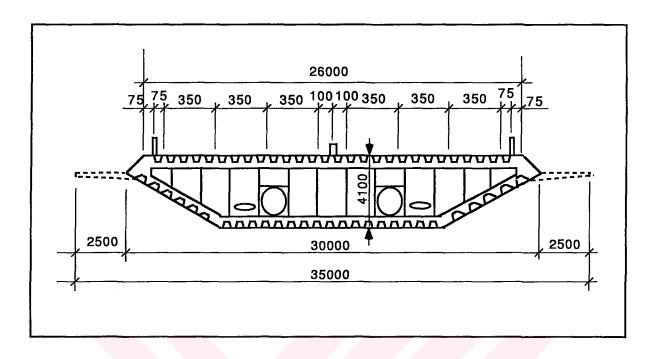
CROSS SECTION, MAIN SPAN (In mm)
